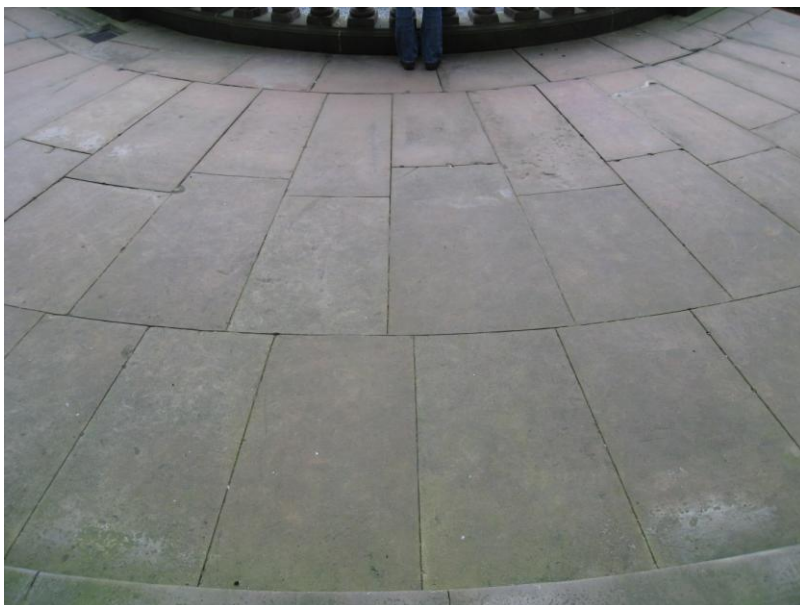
Detail of southeast corner showing radial paving pattern with narrow inner course of small slabs adjacent to balustrade (with dished gutter) and outer row of large single slabs adjacent to steps (from where photograph was taken). The centre of the pavement consists of courses each of two slabs (one larger, one smaller) aligned across the pavement direction. Note the uniformity of slab sizes and regularity of joint patterns (particularly the regular off-sets). (3083)
